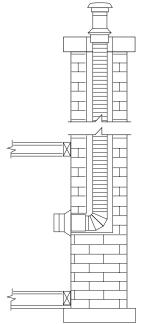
Typical Straight Installation with Listed Chimney Liner
